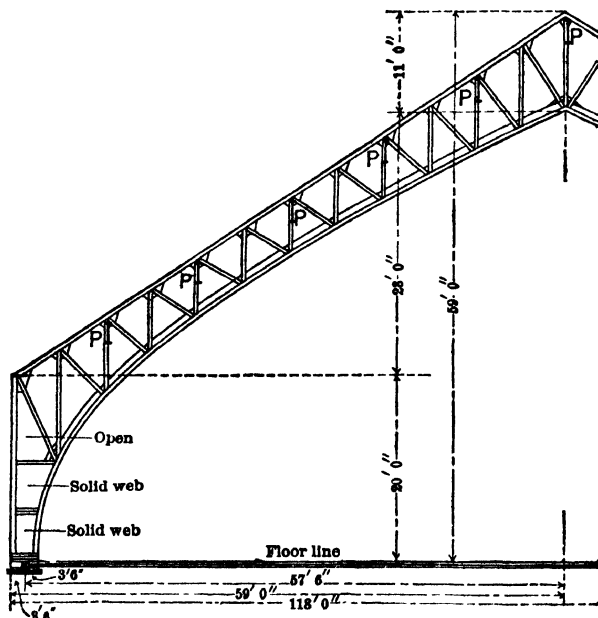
Two-hinged Arch, Exposition Hall, Providence, R. I.
